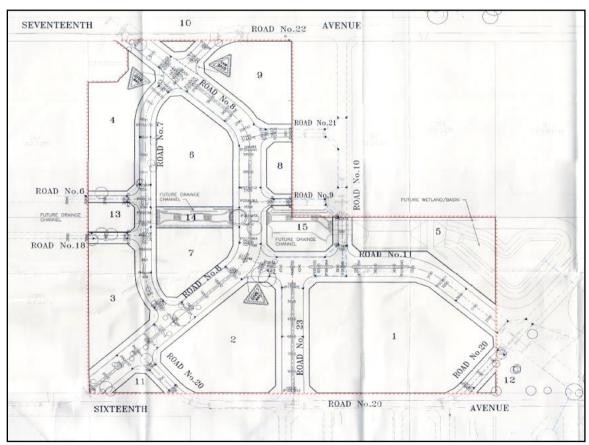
Approved Roads and Stormwater Drainage Layout works approved under DA-64/2007
